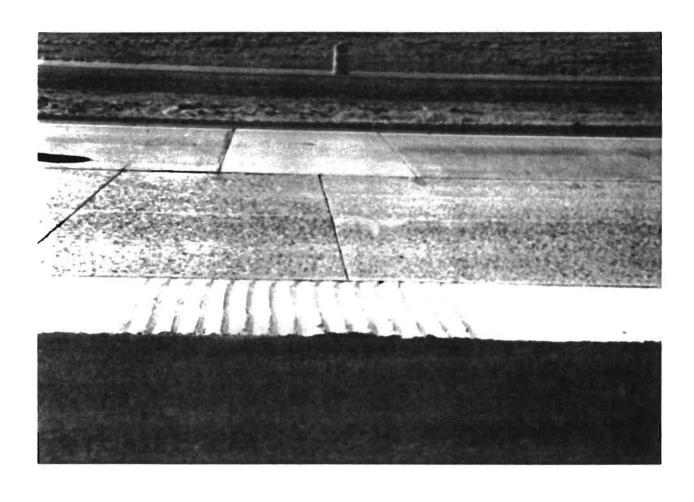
Example of concrete corrugated panels (partial shoulder width).
